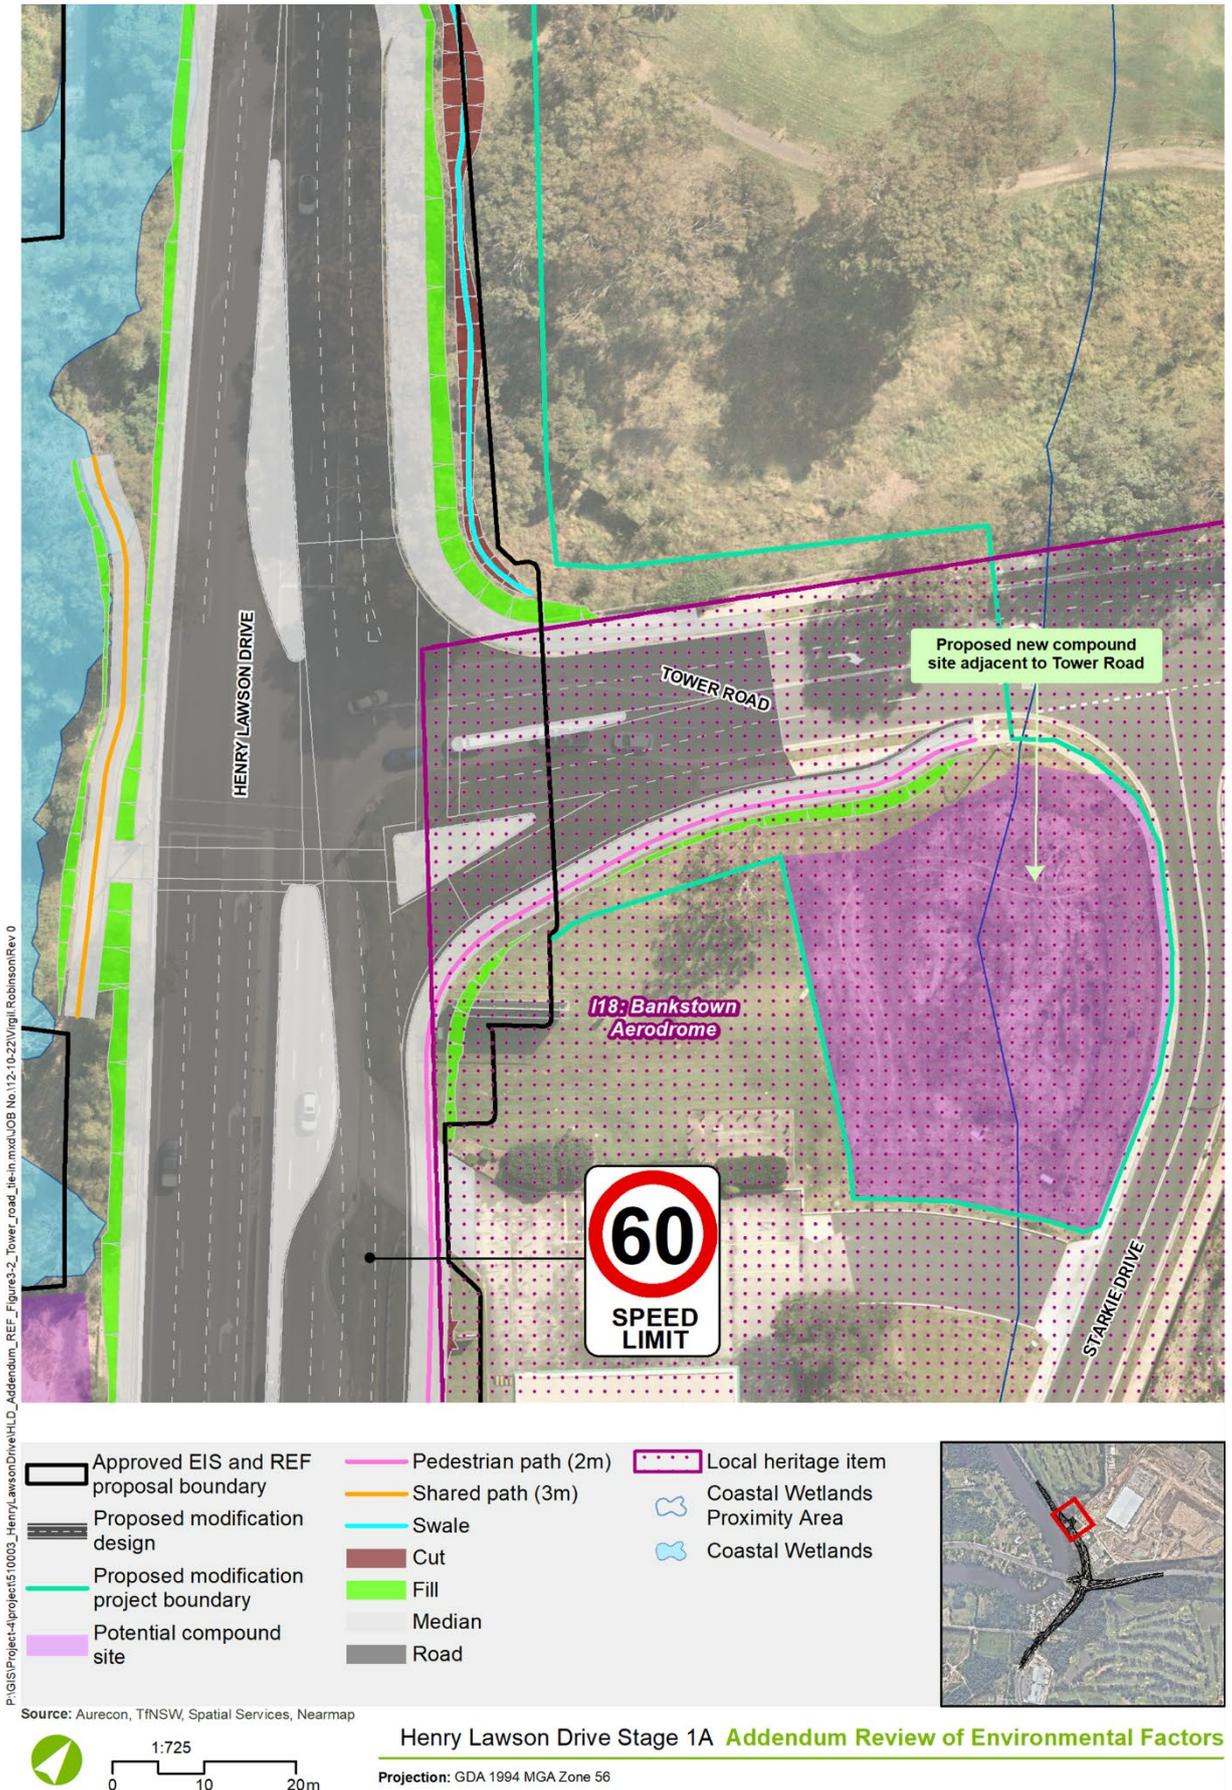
Proposed modification to the Tower Road Tie-in works and new compound site
